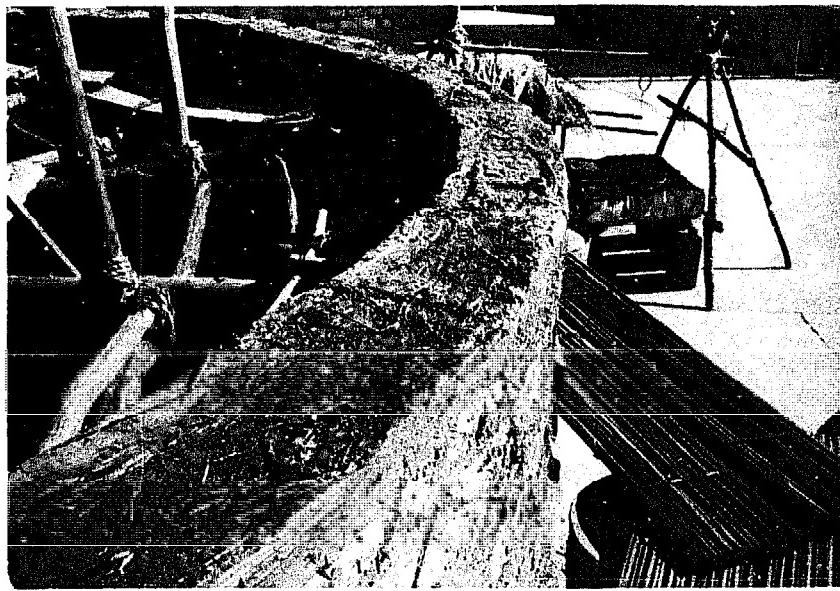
20 cm thick silo wall. Density of the clay/straw wall must be  $966 \text{ g/cm}^3$  or more.
